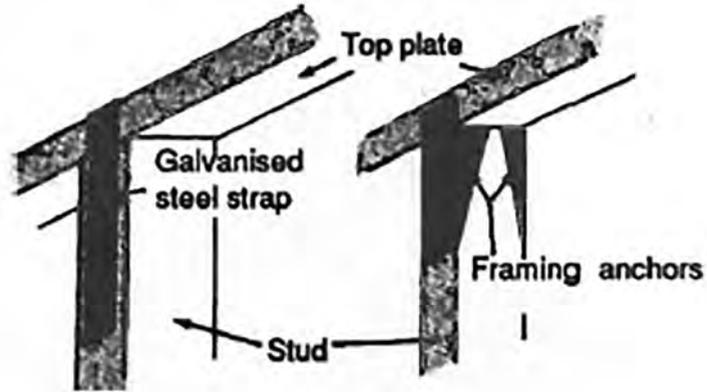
ANCHORING THE TOP PLATE TO THE STUDS
